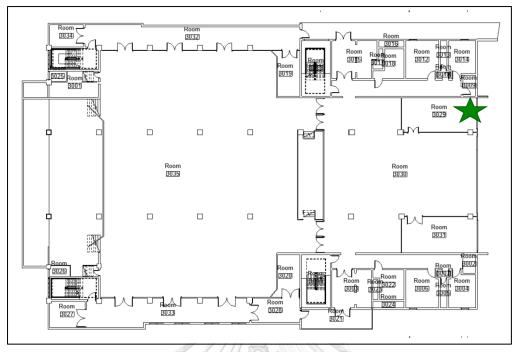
The floor plan of 3rd floor with respective Room numbers
